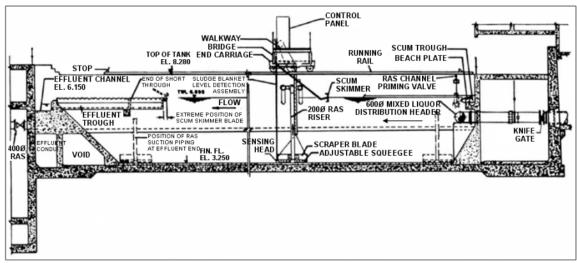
Section of Secondary Clarifiers 11 to 26
